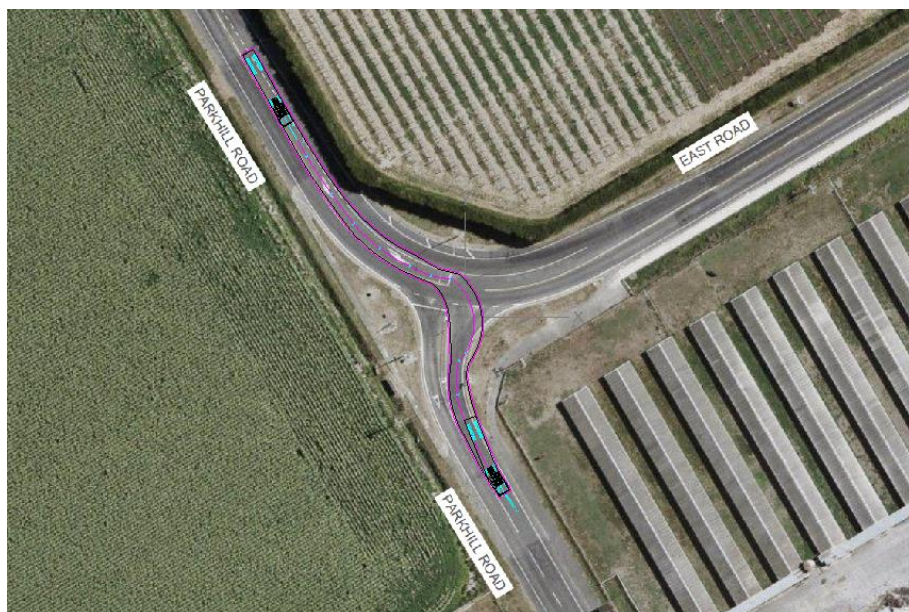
Vehicle tracking – Parkhill/East Road intersection – Right-turn onto Parkhill Road (South)
